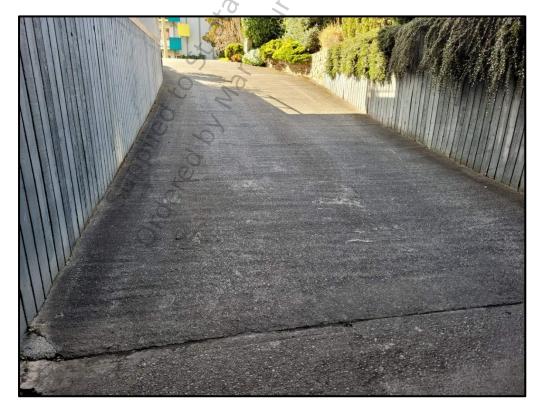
(G20 10 00) - Concrete Pavement at Parkade Ramp
